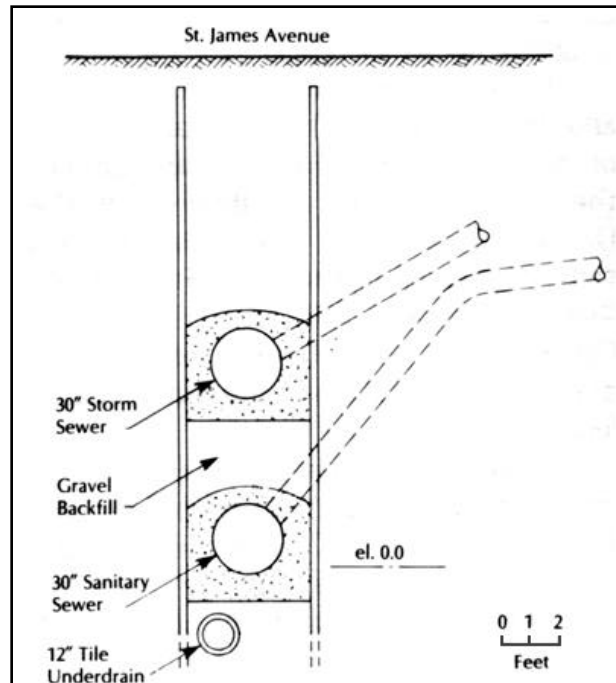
A typical cross section of the St. James Avenue sewer.
